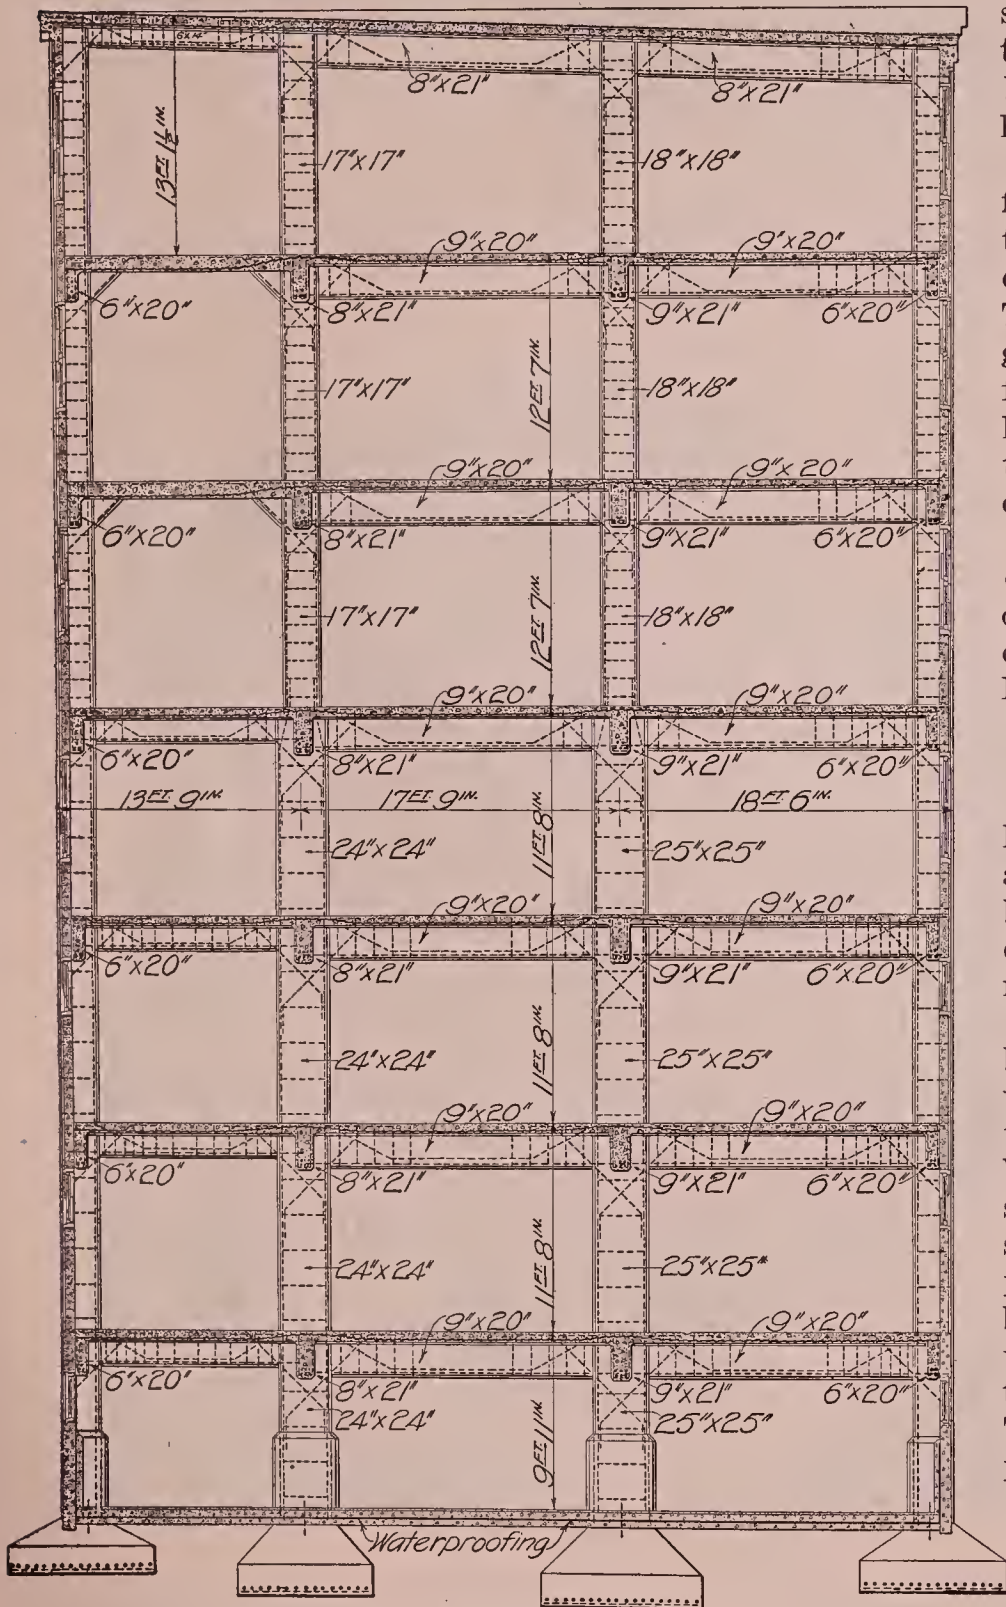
Cross Section Through Lynn Storage Warehouse.
